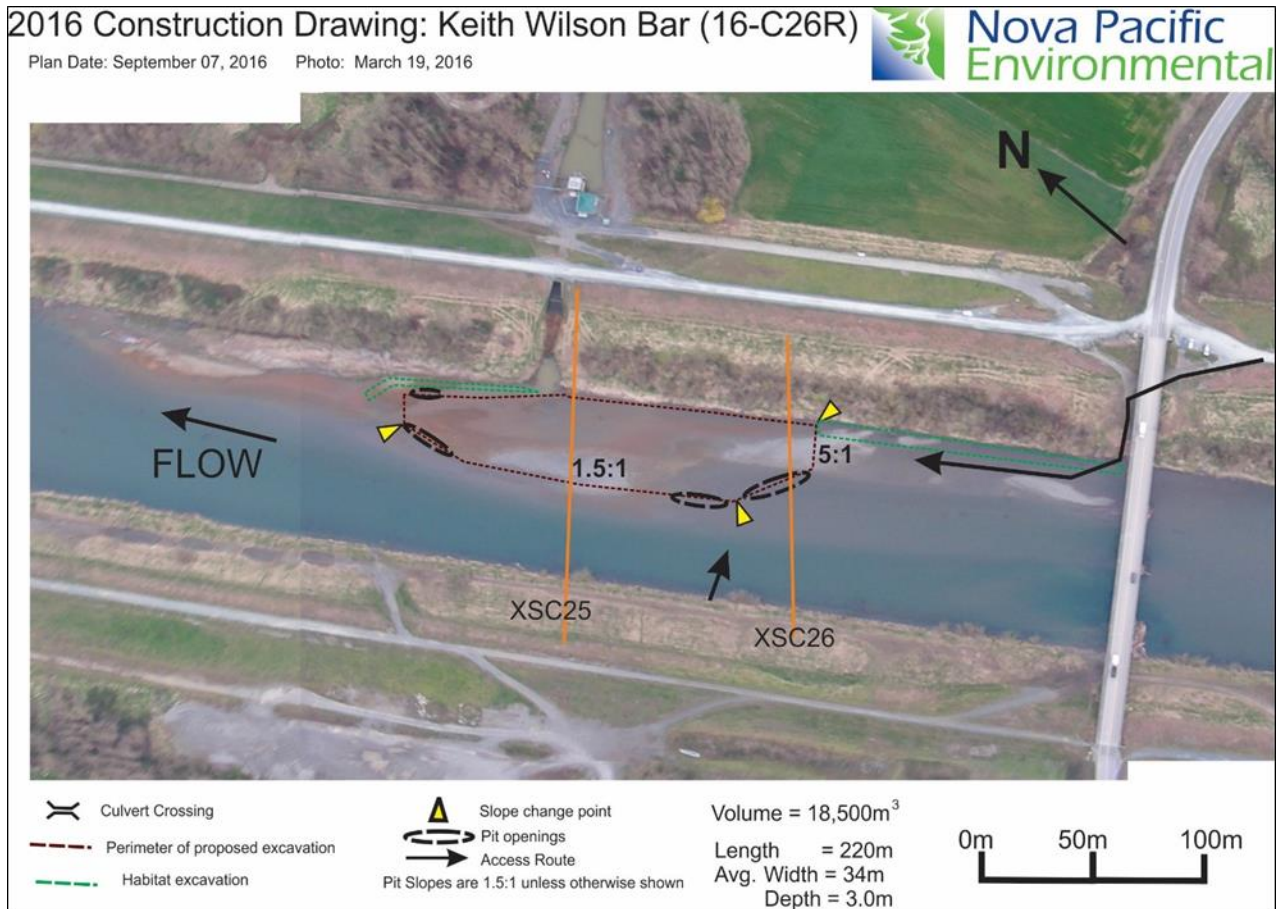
Aerial view of the Keith Wilson Bar excavation plan. Photo taken March 19, 2016, drawing – September 7, 2016.
